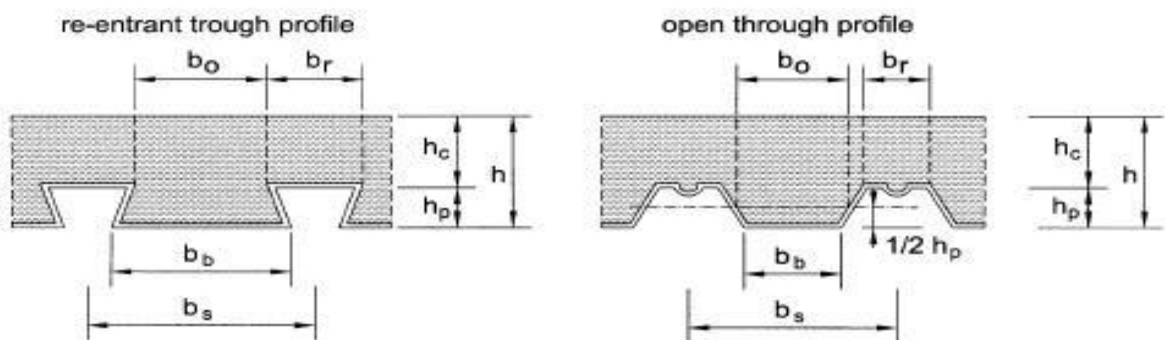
Sheet and slab dimensions (source EBCS EN 1994-1-1)
